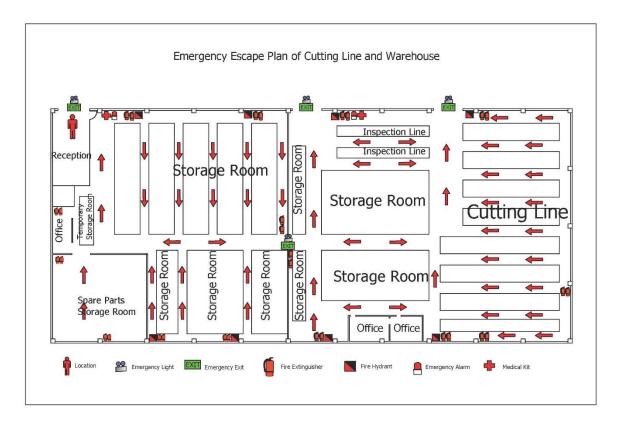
Emergency Escape Plan of Cutting Line and Warehouse
